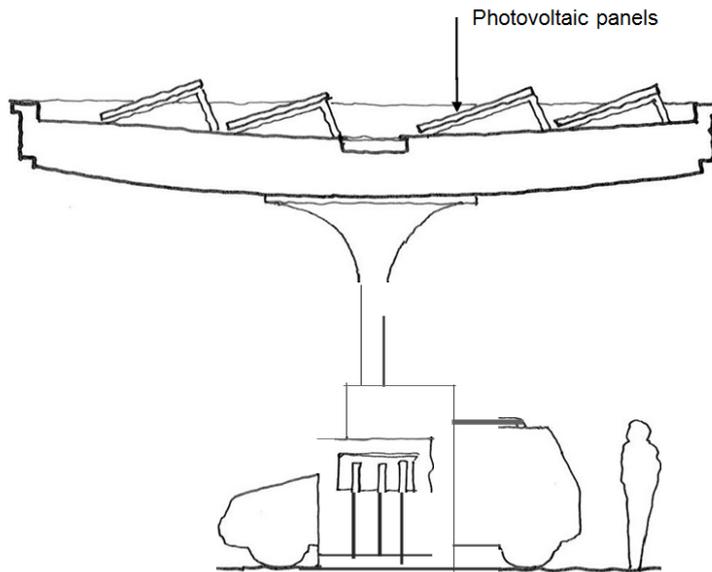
Photovoltaic panels installed on a fuel canopy, but not visible from the street.
